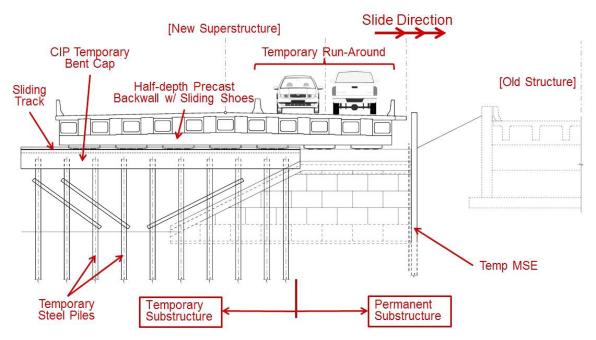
Section through the deck of the new superstructure (at abutment) on temporary location
